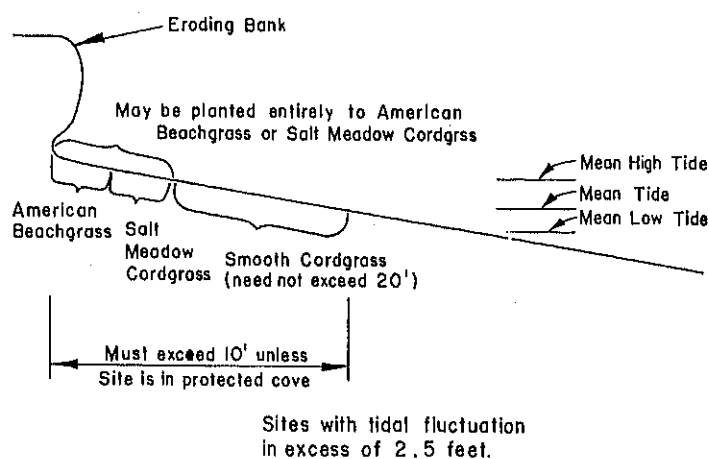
Recommended planting arrangement when tidal fluctuations exceed 2.5 feet
